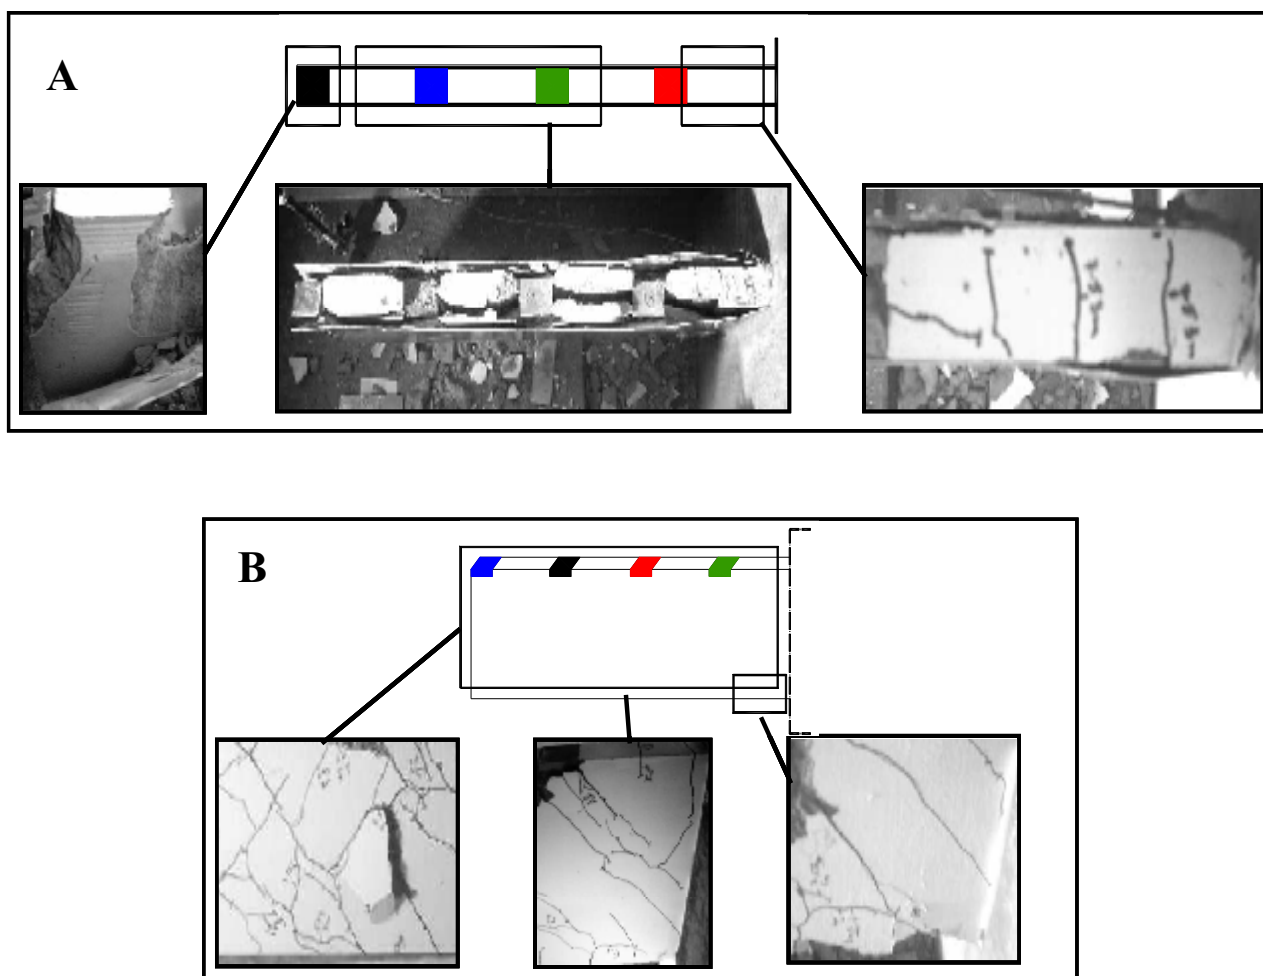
(A) Failure of S-C-S shear wall, (B) Failure of conventionally reinforced shear wall on impact loading
